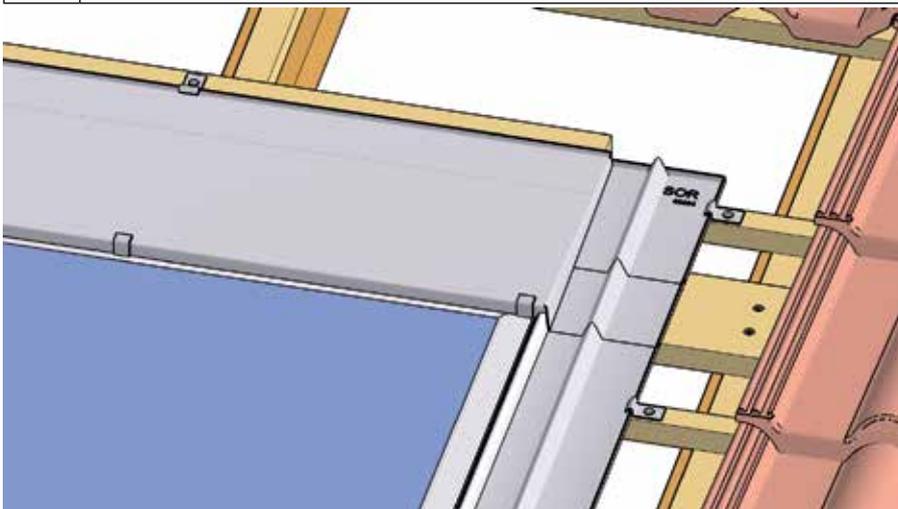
Fixing for flashing on flashing side top right and flashing top
